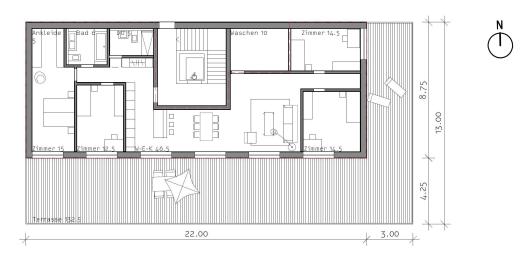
Floor Plan Attic Residential Unit (Unit Architekten)
